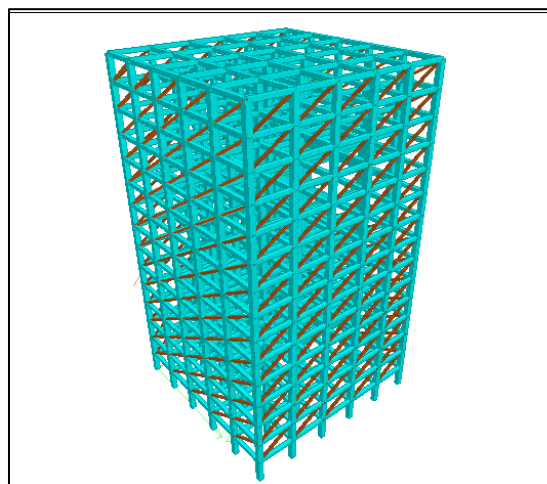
3-3D View of Multi-Storeyed Building with Diagonal Steel Bracings
